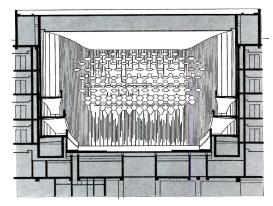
Transverse section A-A. Note rectangular cross-section of the hall
